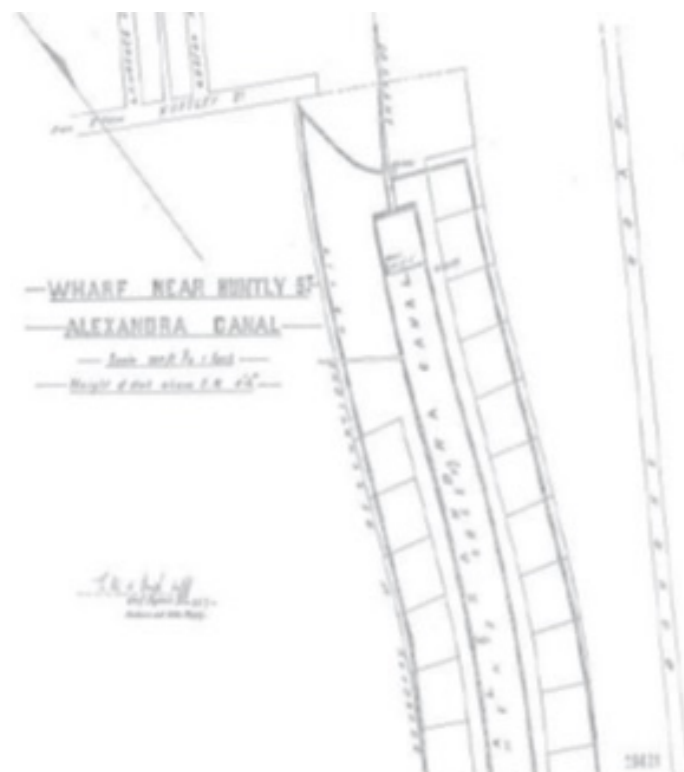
The 1911 plan of the Alexandra Canal shows the finished Canal and the locations of the Wharf/s and the lots for the Woolsheds in the Woolshed Reach section. Source: DPWS Plan Room Drg 29429.
